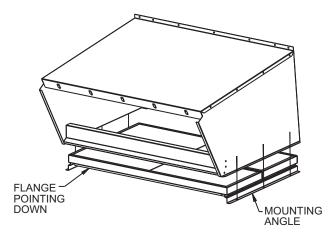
Bottom Filters Installed with Flange Pointing Down
